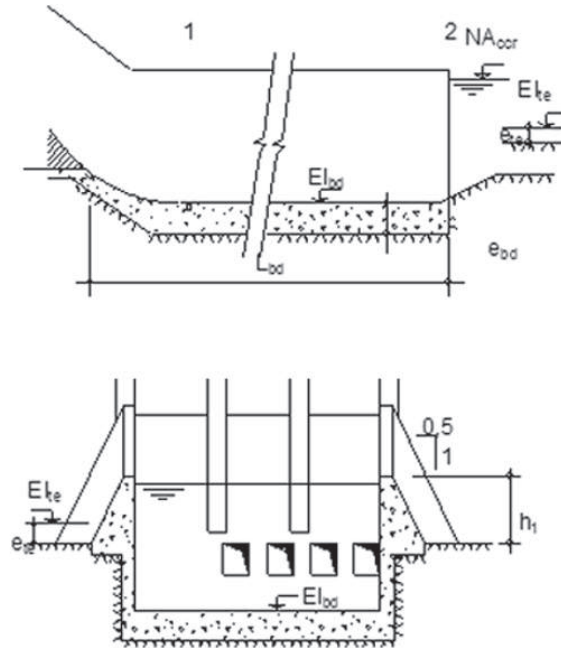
Typical cross-section of a stilling basin.
